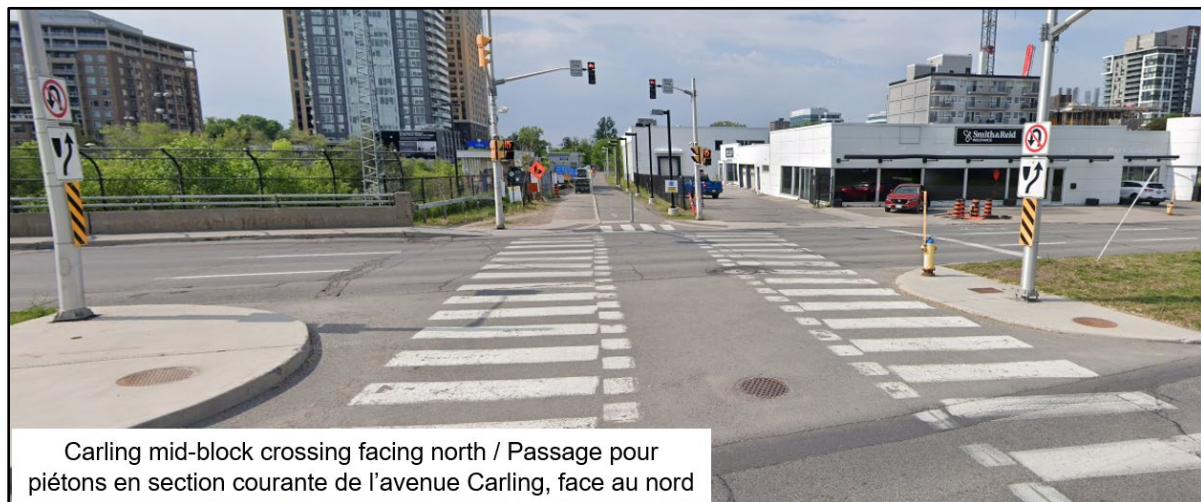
Existing Midblock At-Grade Crossing of Carling Avenue
